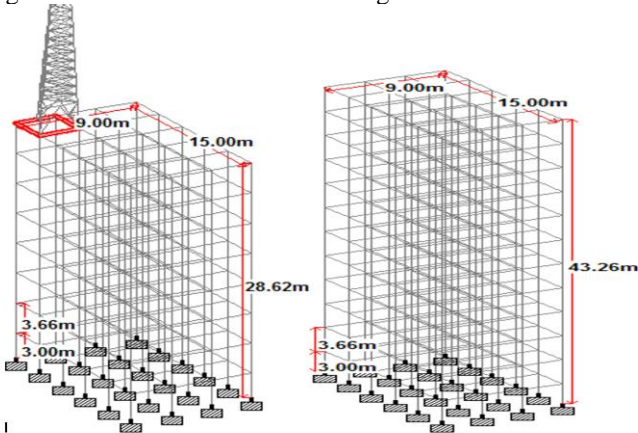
3D Elevation Model-5 Figure: 6 3D Elevation Model-6
